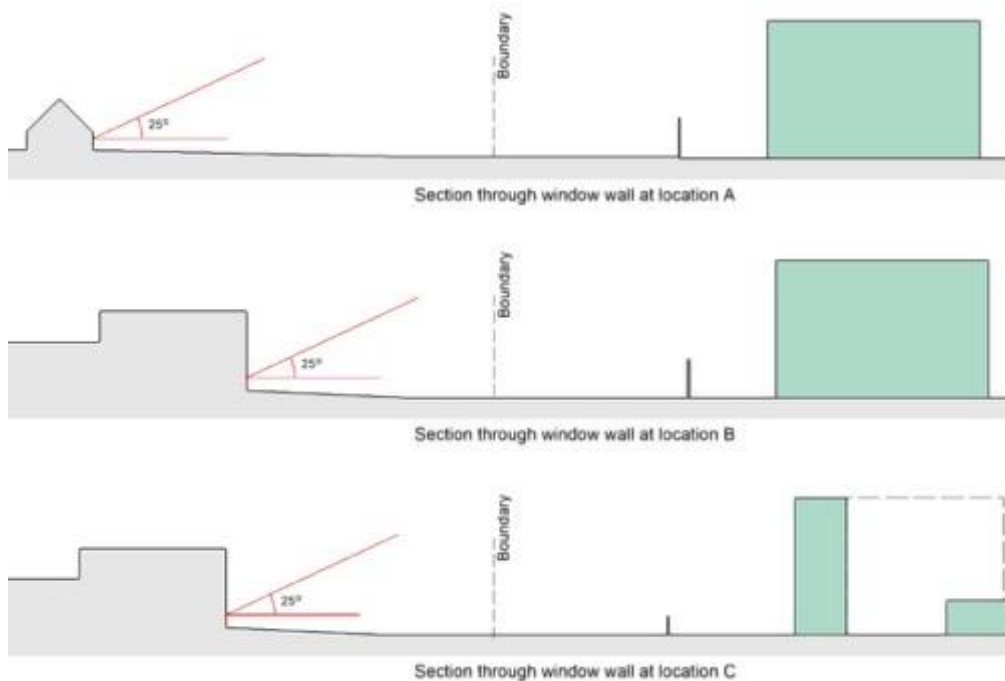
Section perpendicular to window walls of existing buildings at locations A – C, which are identified on plan in Fig.4
